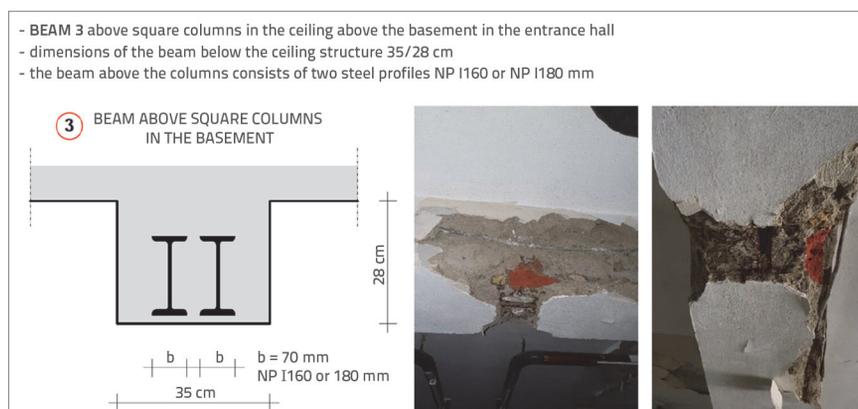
Examples of conducting investigation works on load-bearing elements of steel beams concealed by cladding [7]
